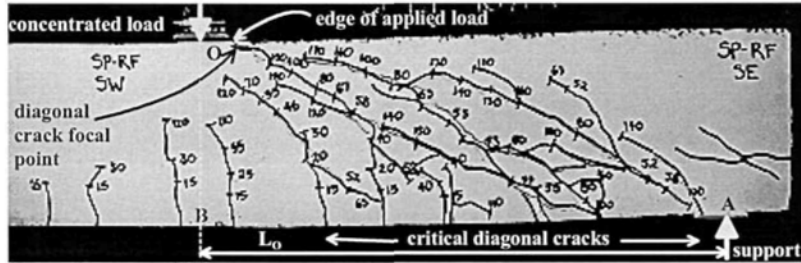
Critical diagonal cracks in beam with stirrups
